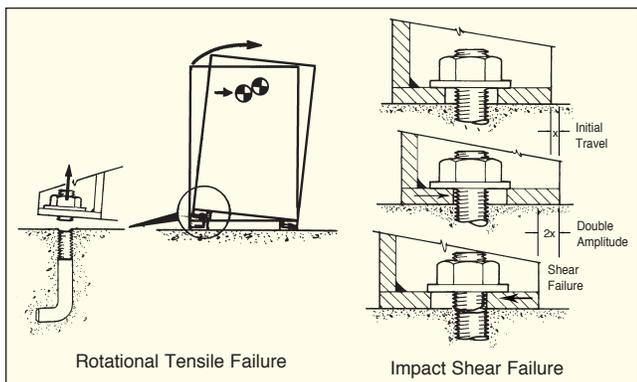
Anchor bolt failures caused by excessive bolt hole clearances.
